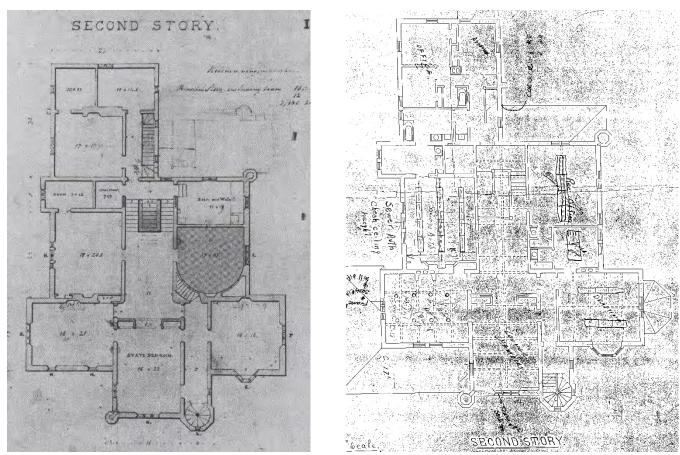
The second-floor plan of the Harral House at left. The stair within the chamber on the right is not shown on the first floor. Whether is existed or not is unclear. Note similarities to Daniel Robert House at right. (From Anne Castrodale Golovin, *Bridgeport's Gothic Ornament: The Harral - Wheeler House.*)
